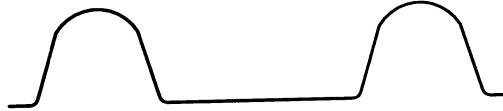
Part of typical trapezoidal profile with rounded crowns
